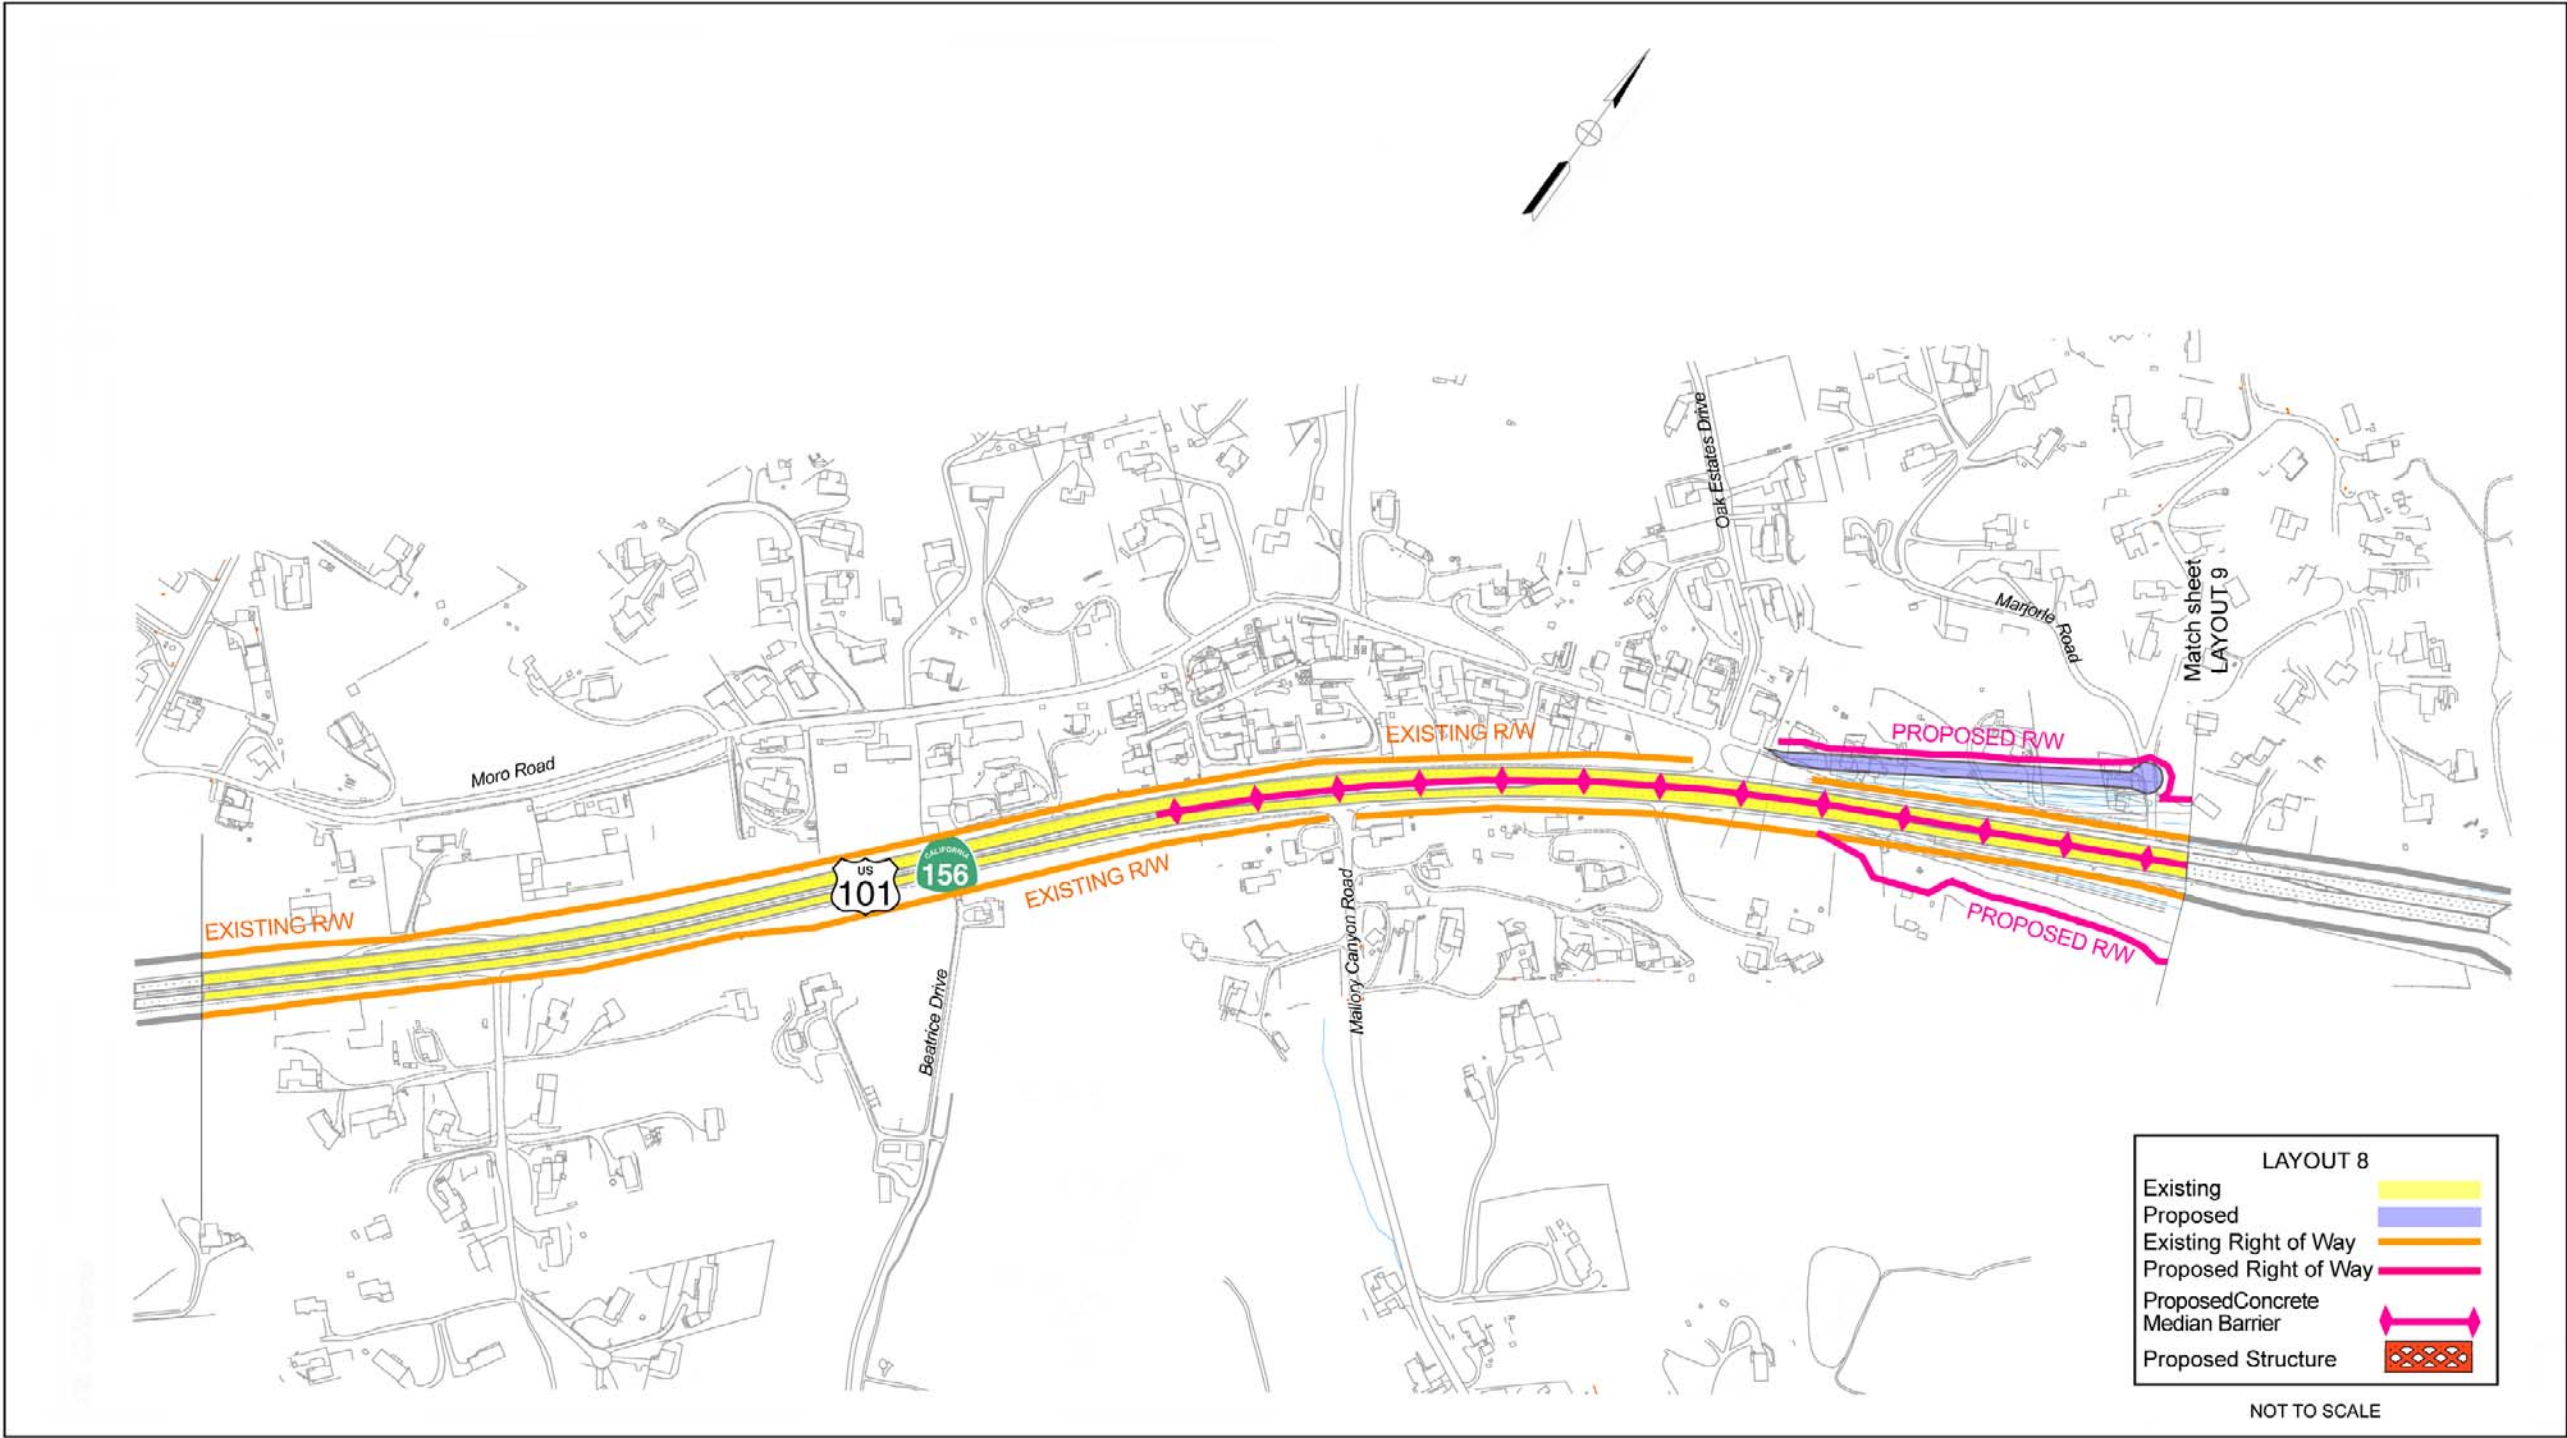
Build Alternative Design, Mallory Canyon Road Location
